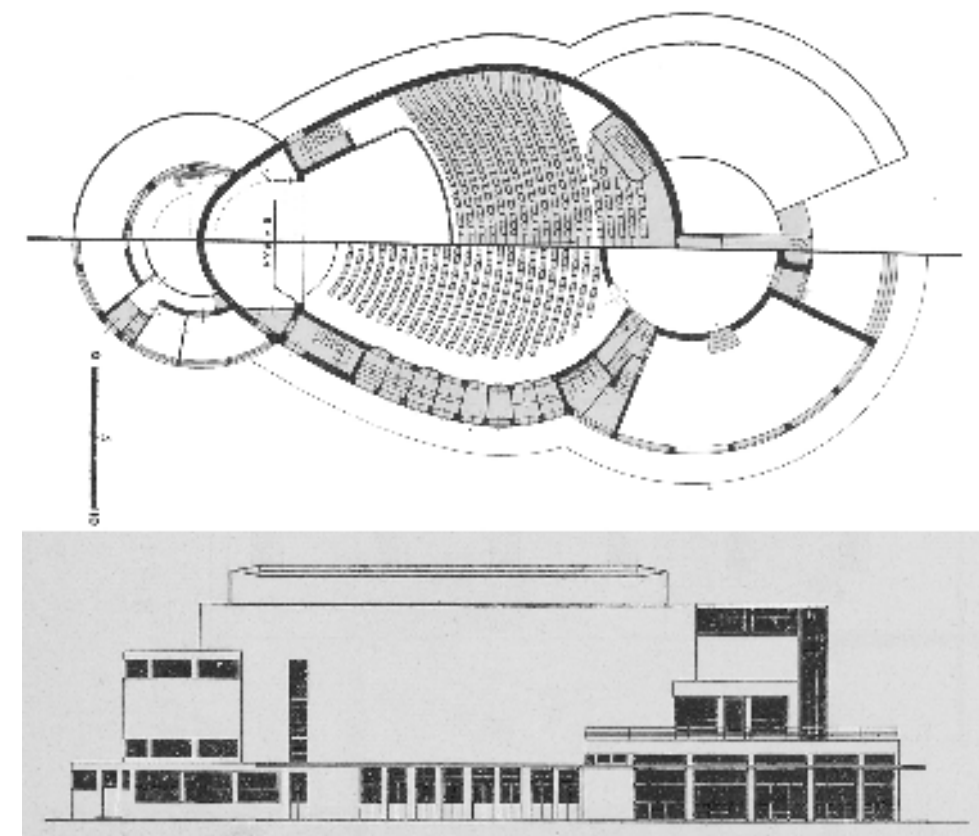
Original plans of the ground floor and first floor and elevation of the Kina Project, 1926.
